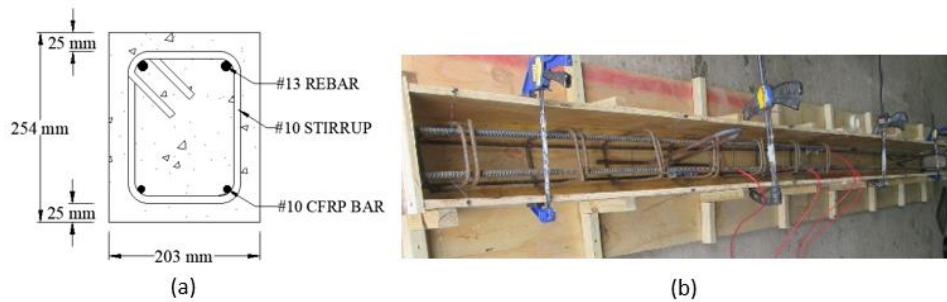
Conventional beam. (a) beam section and reinforcement detail. (b) beam prior to testing.
